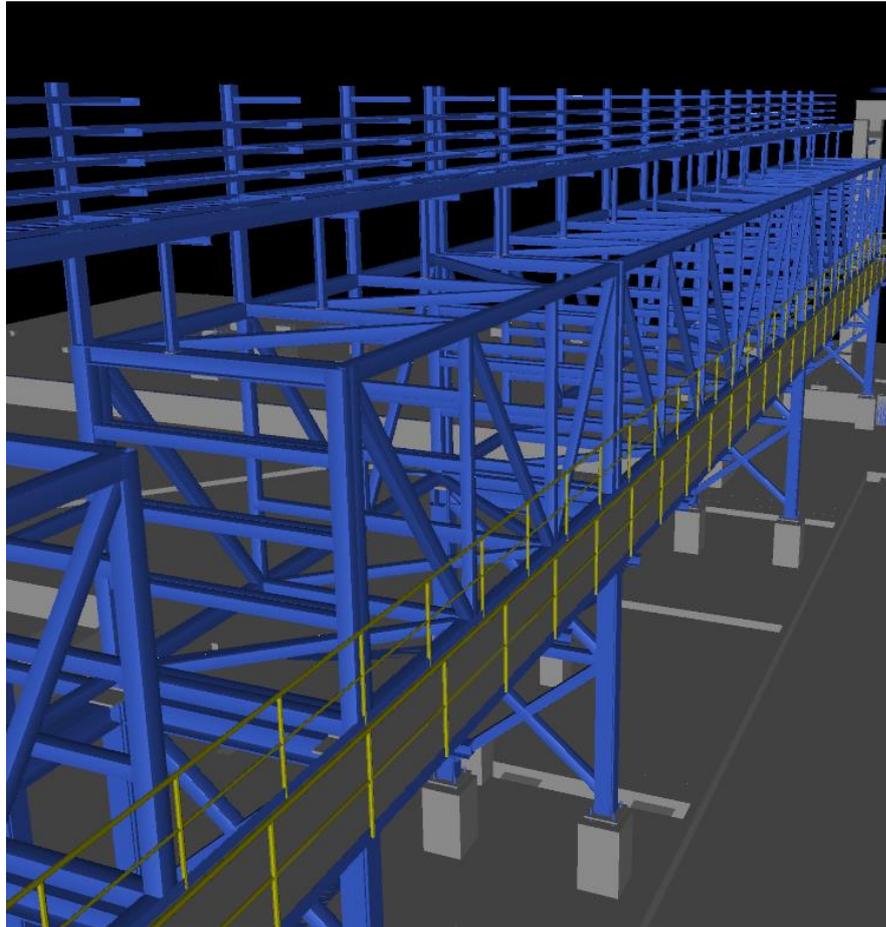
Pipe bridge where cable trays and walking platform is outside the bridge
